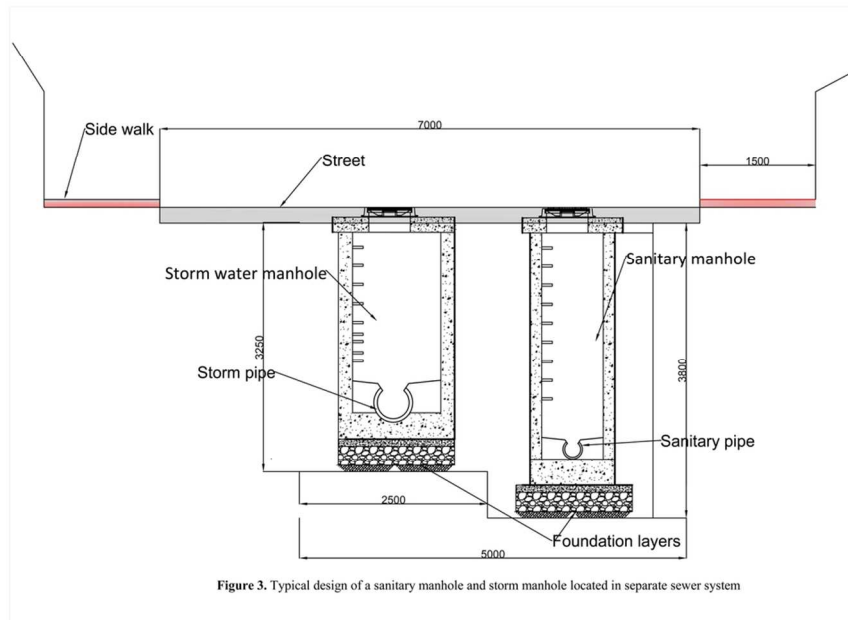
Typical design of a sanitary manhole and storm manhole located in a separate sewer system
